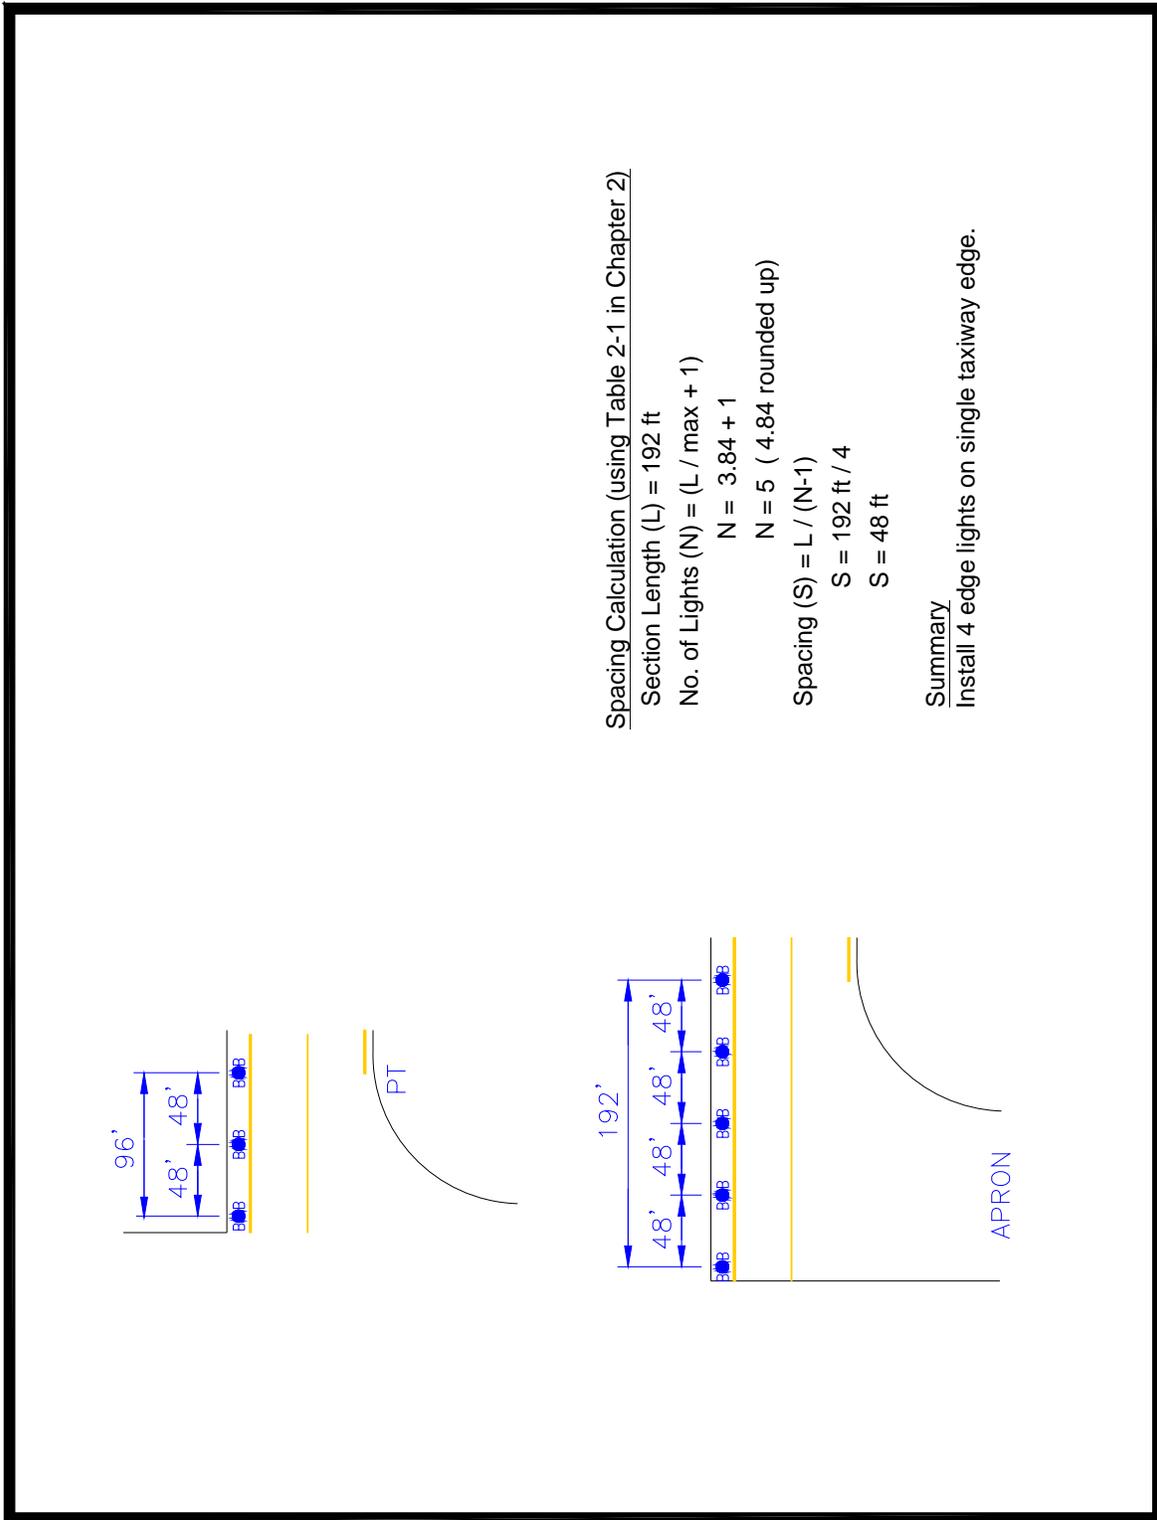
Typical Single Straight Taxiway Edges (Less Than 200 Feet (61 m)).
